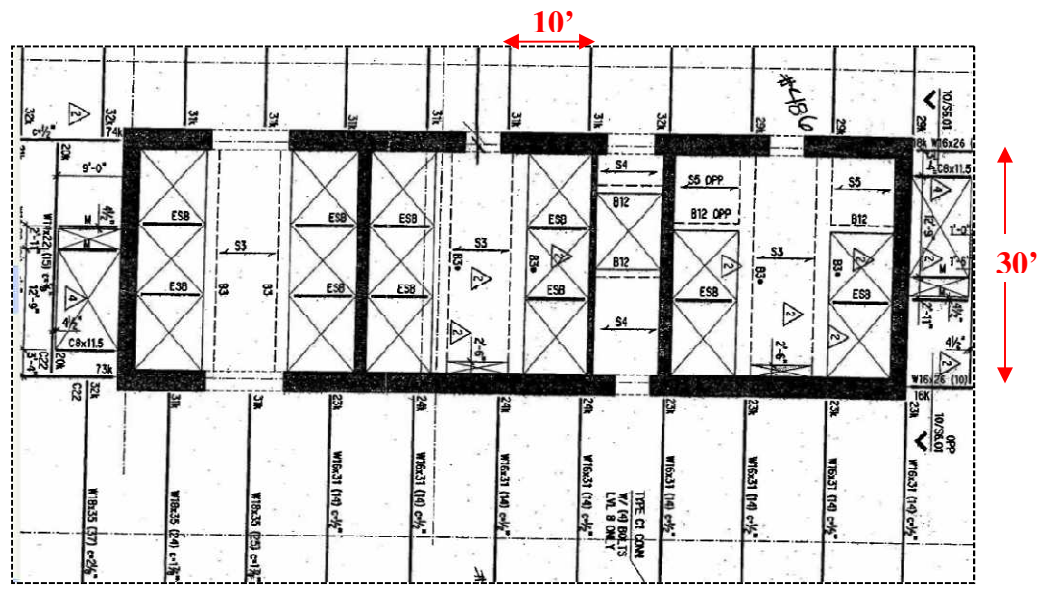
Shear wall layout (IDX Tower, Seattle, WA – 40 story, provided by Magnusson Klemencic Associates, 2006)
